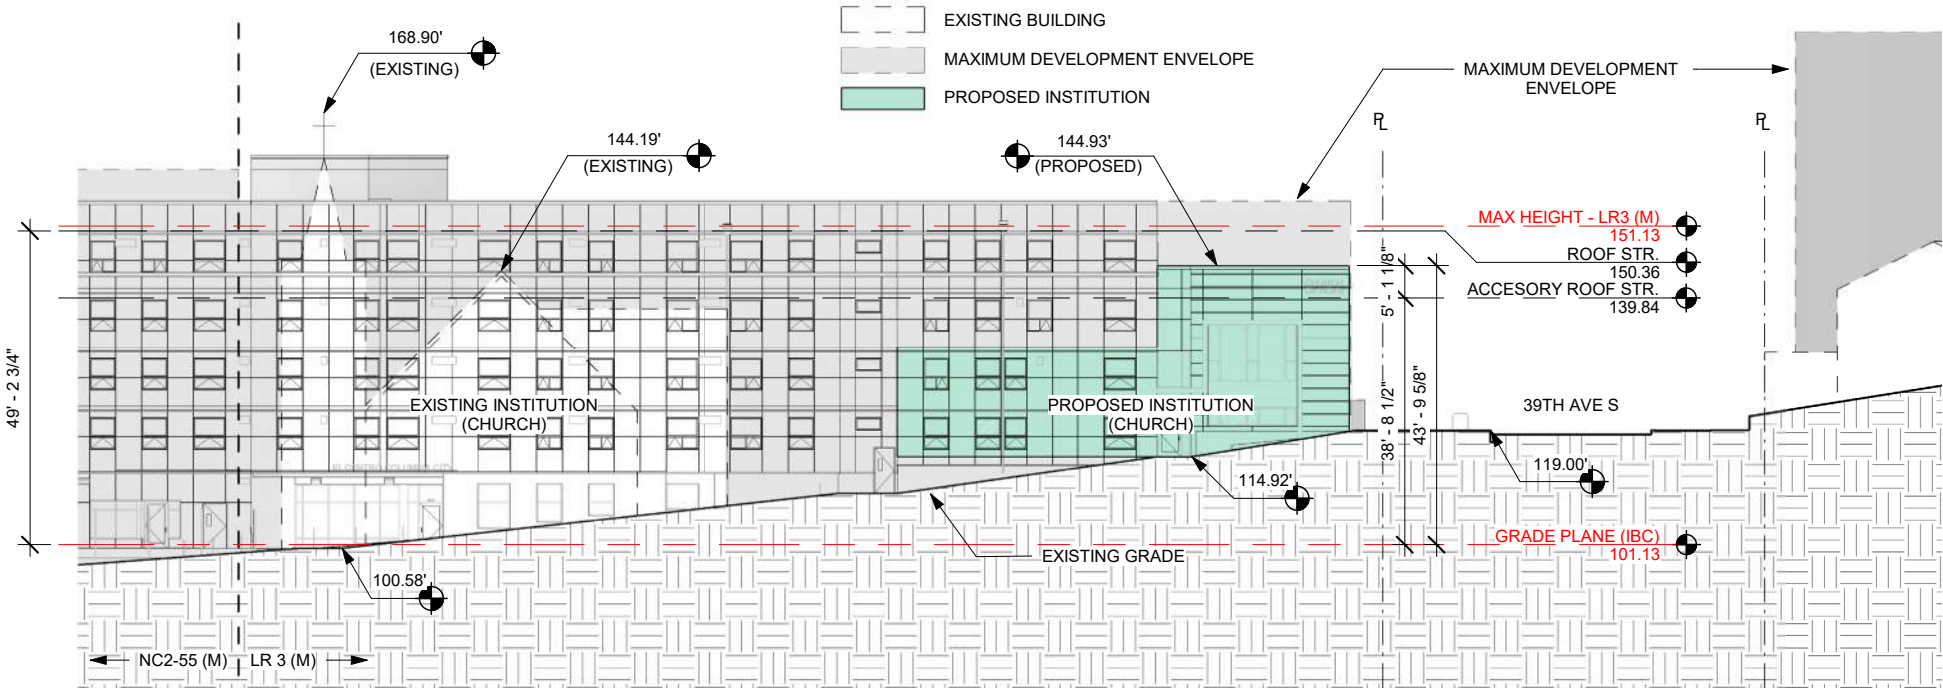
Elevation. Proposed institution location, height, and maximum development envelope.
